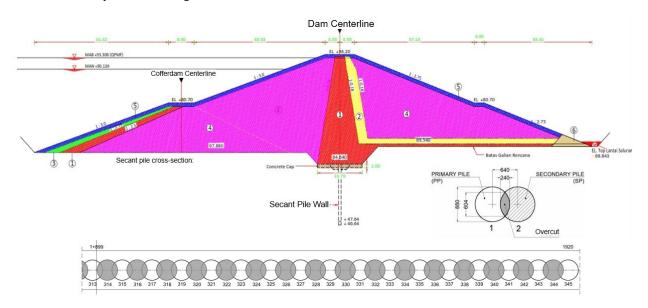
Typical cross section showing the secant pile wall beneath the main dam, and pile layout
